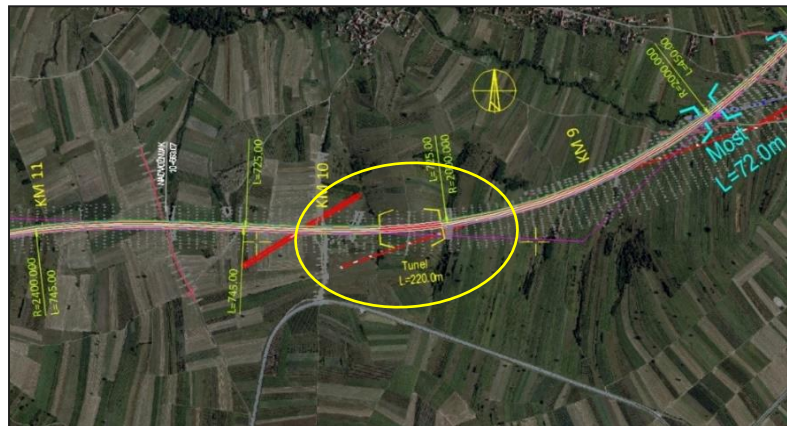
Tunnel 4 “Vrsnik” proposed layout
